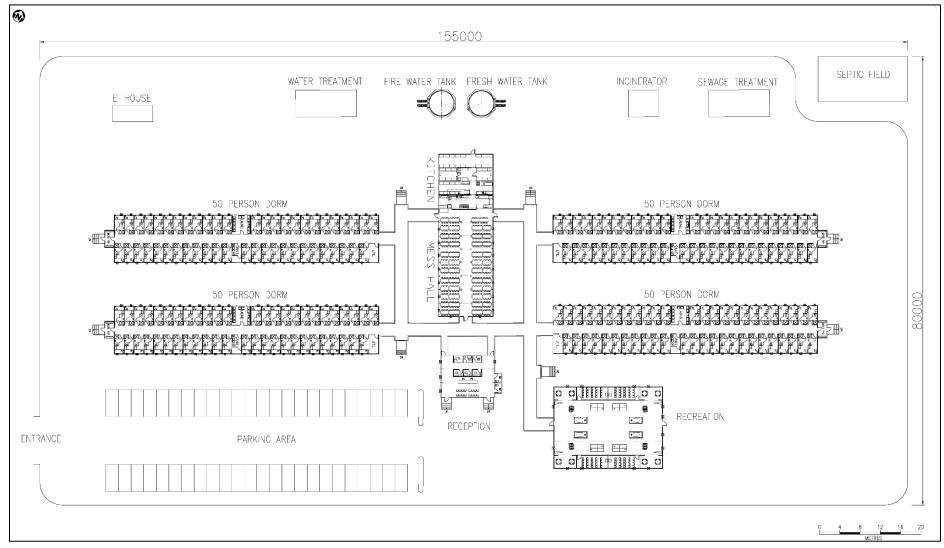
200-Room Permanent Accommodation Camp Layout
